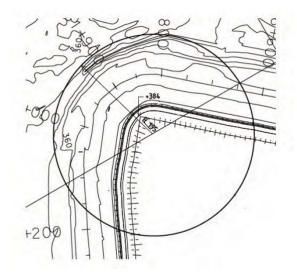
Plan of existing corner between the dam sections E-F and G-H. The radius is 195 m.
